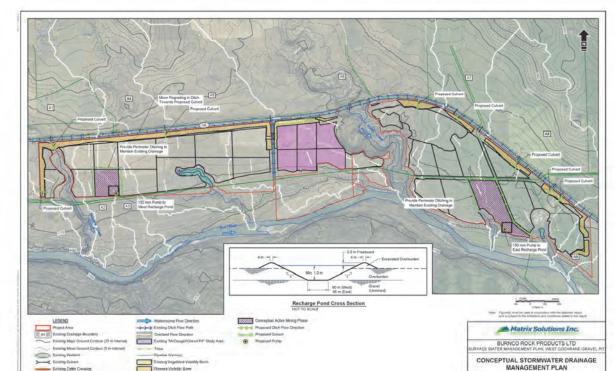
Drainage Management Plan (Recharge Ponds Locations)
